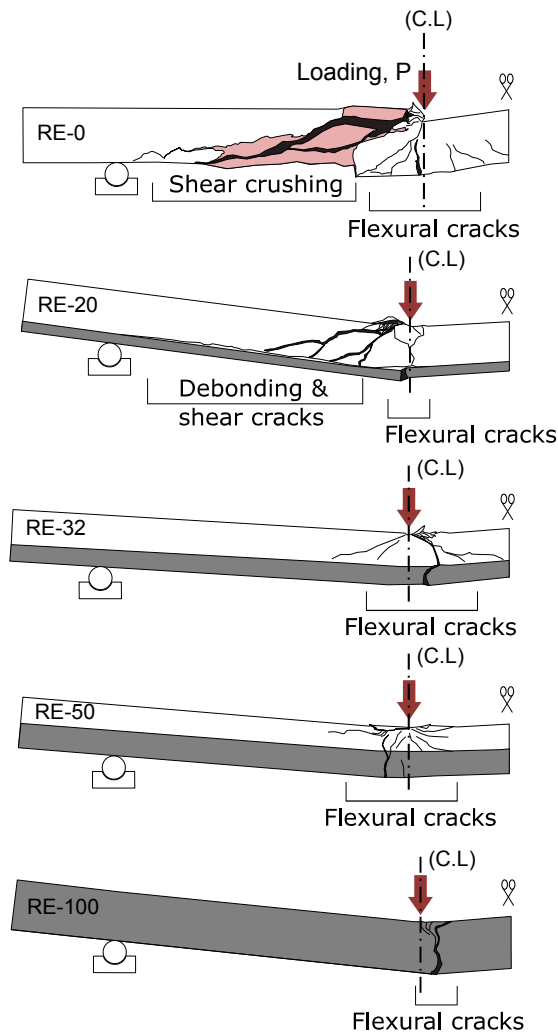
Cracking behaviors of the specimens after the static loading test [5]
